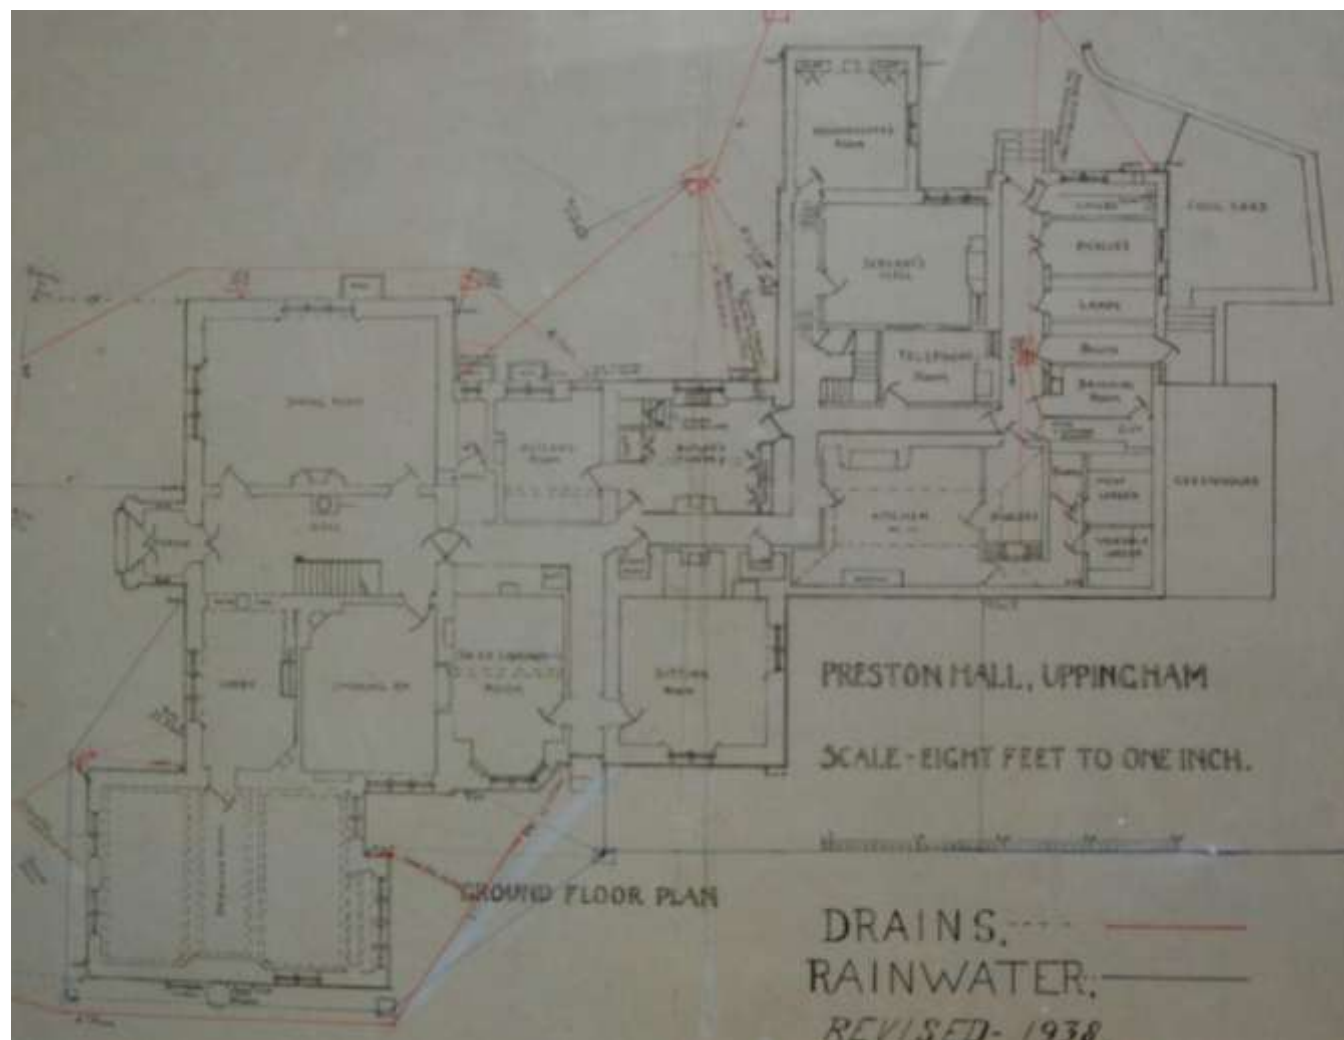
Ground floor plan of 1931, revised 1938 (Micklethwait family archive, not to scale)
